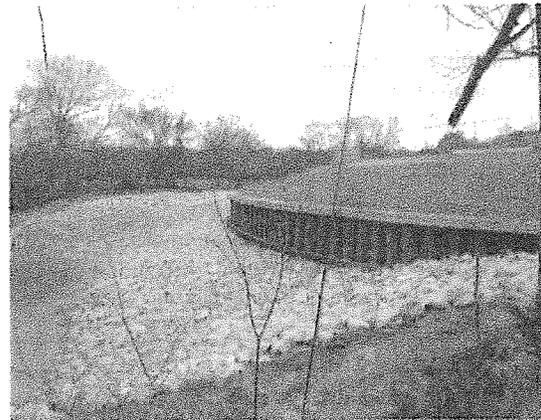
Streambank Protection: Steel sheet piling with rock armor
